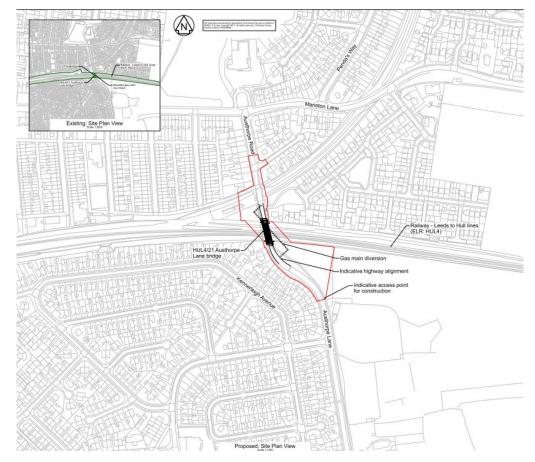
Site layout plan of Austhorpe Lane Overbridge and adjacent Footbridge
